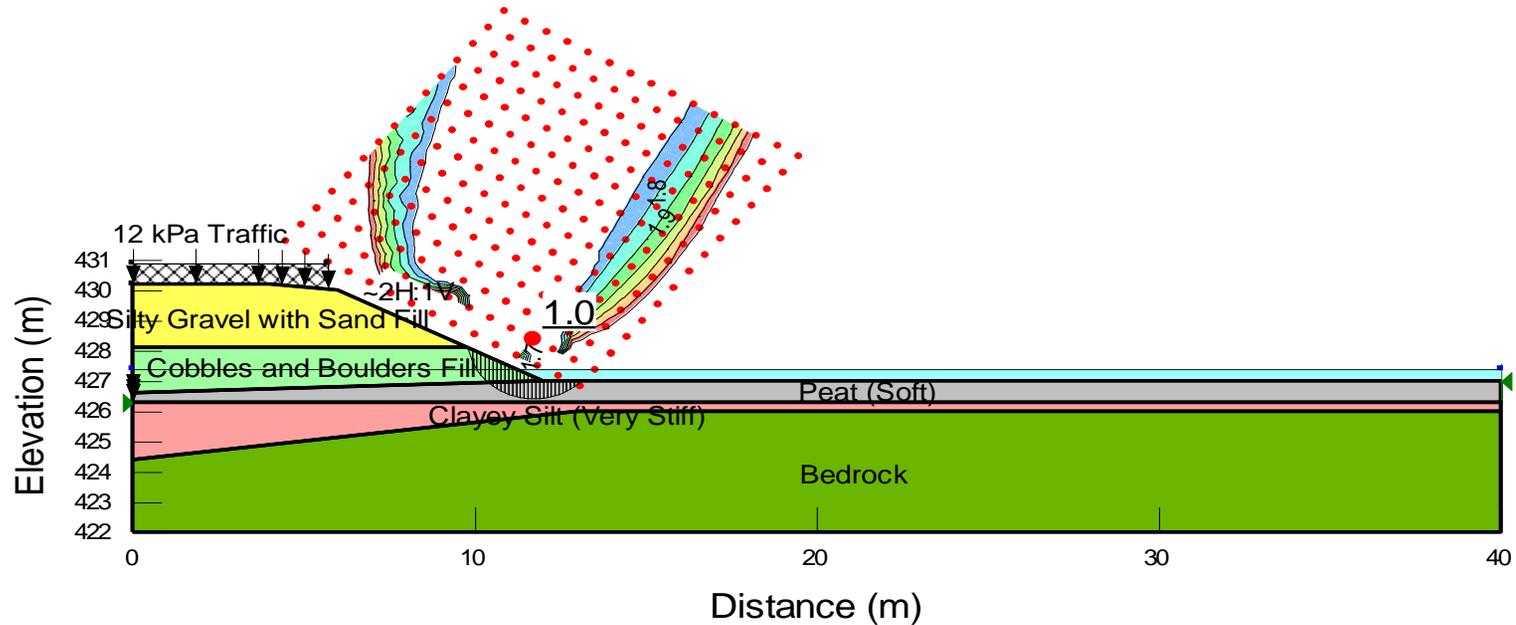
North embankment (inlet) – drained static condition with peat below embankment
